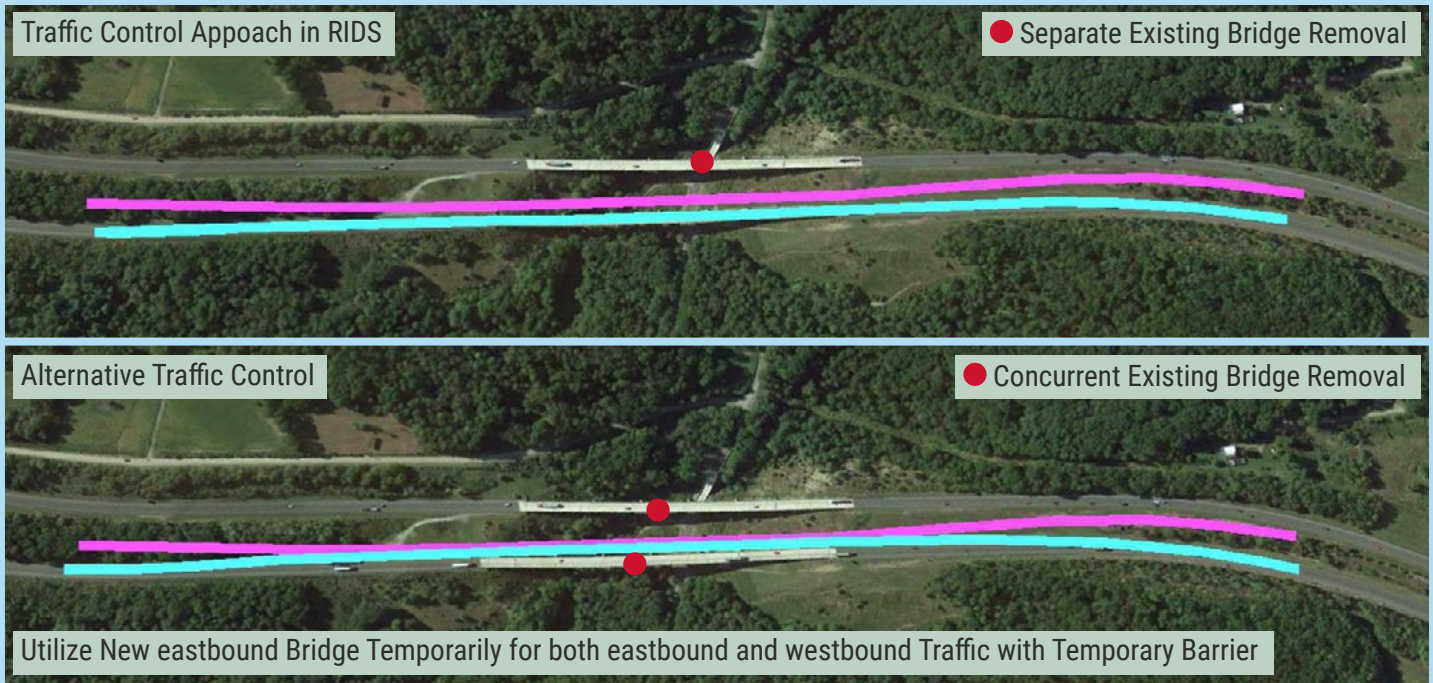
ALTERNATIVE TRAFFIC CONTROL WITH CONCURRENT EXISTING BRIDGE REMOVAL AT I-80 NORTH FORK BRIDGES
